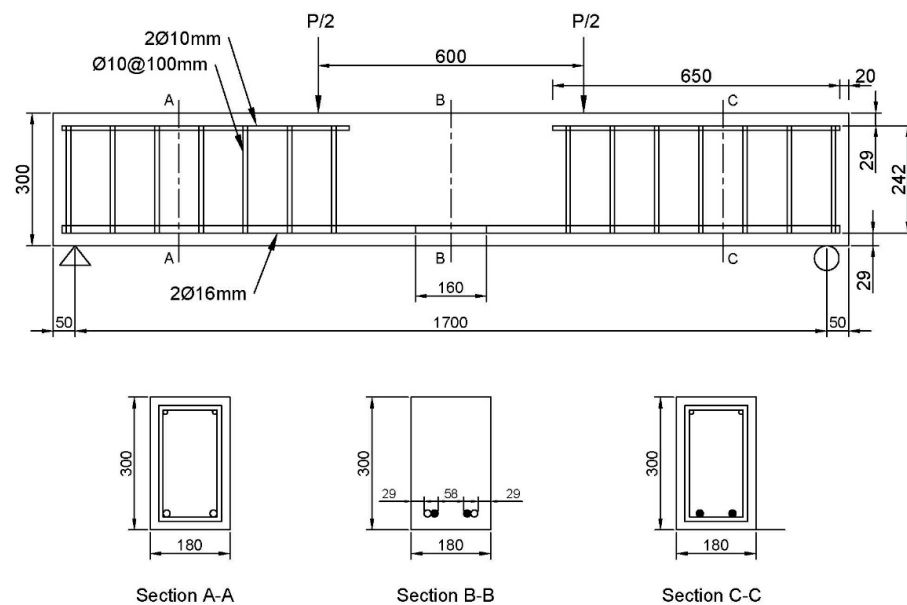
Beam specimen details for group (1) with splice length of  $10 d_b$  (160 mm).
